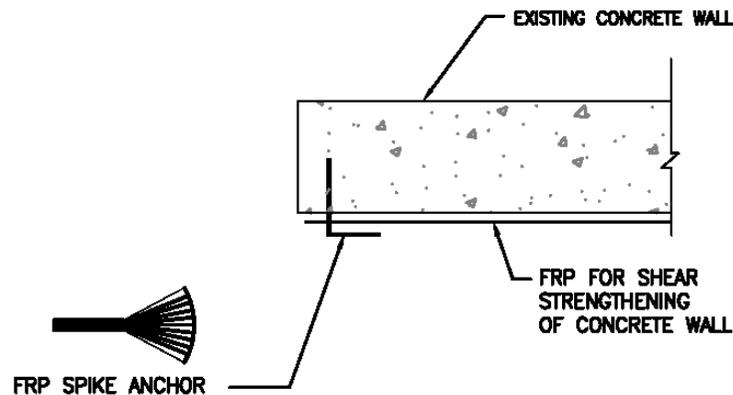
Plan view showing FRP spike anchors at wall FRP termination
